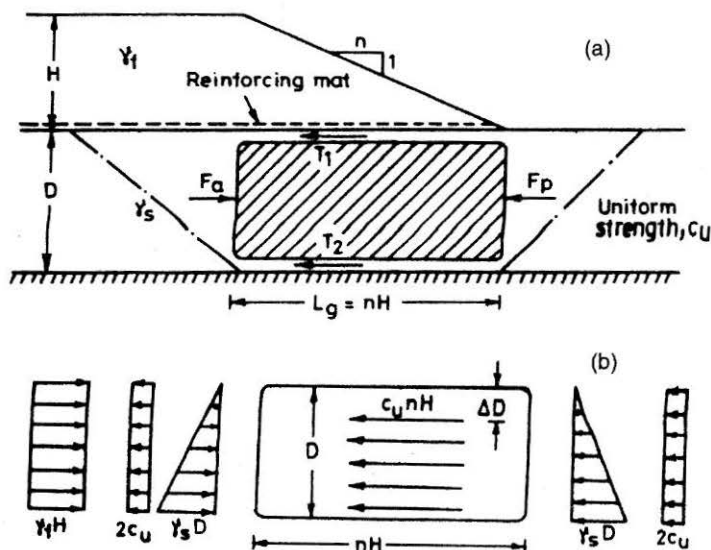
Squeezing Failure of Foundation with Uniform Strength over a limited Depth above a Rigid Layer (after Van Zanten, 1986)
